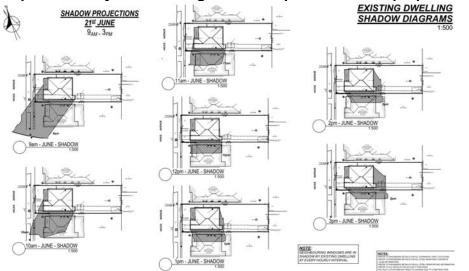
Proposed hourly shadow diagram 9am- 3pm June 21 for previous dwelling
